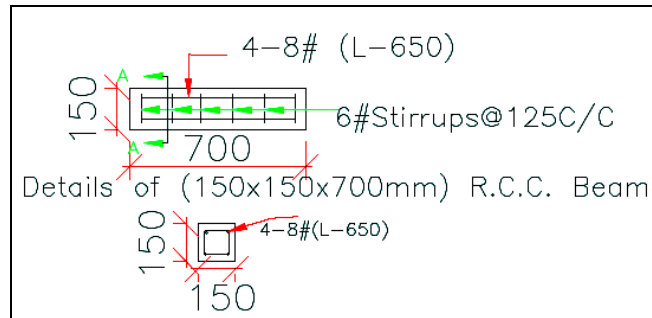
Detailing of Reinforcement in RC Beam Specimen
